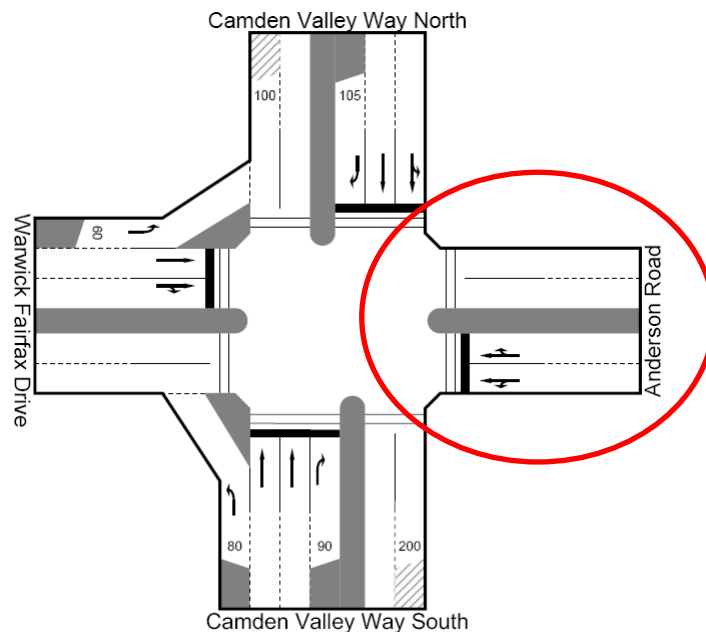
Existing Anderson Road and Camden Valley Way Intersection
